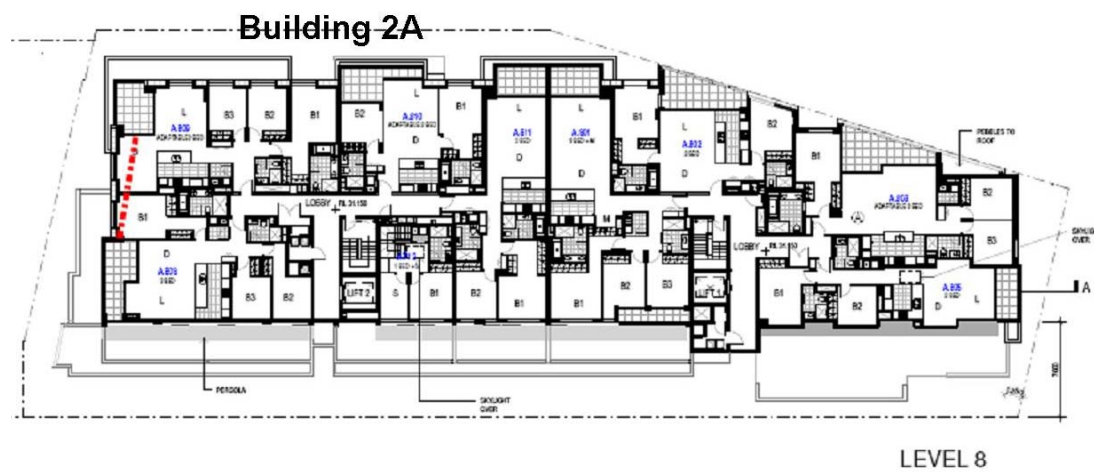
Building 2A – Level 8 - encroachment into northern setback area shown dashed.
